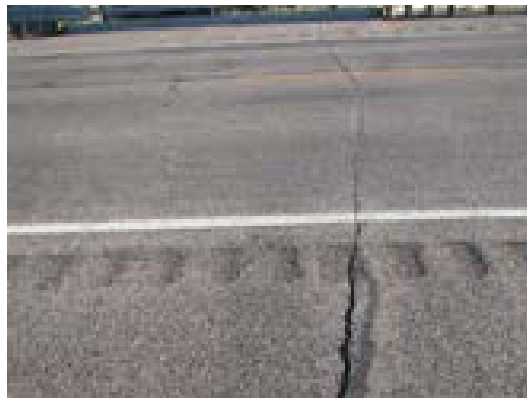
Bridge D-24-O Cracking of the Bridge Deck
